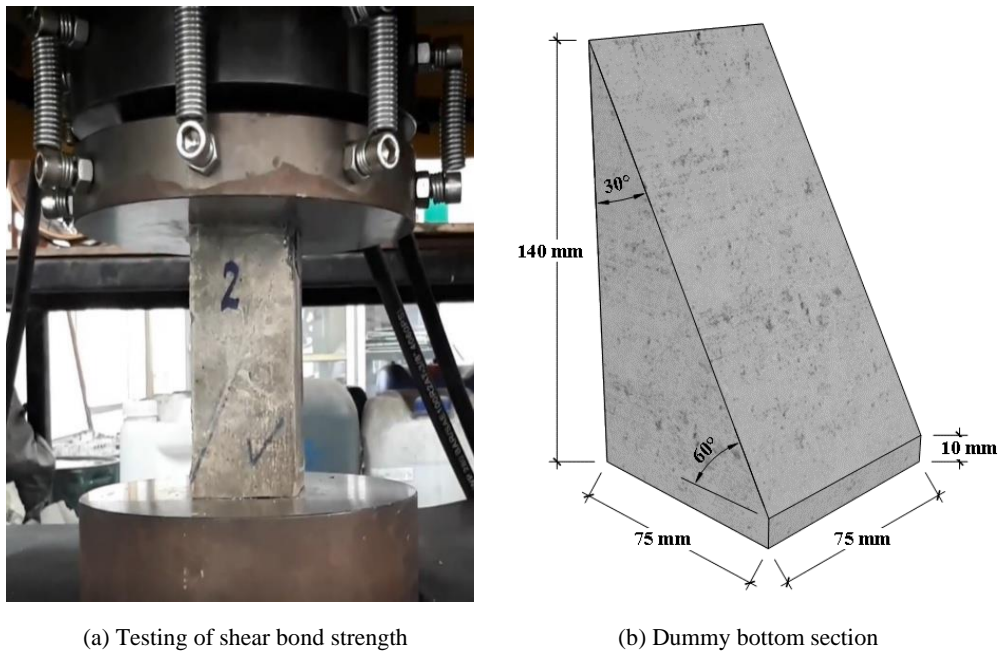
Shear bond strength test of high-calcium fly ash geopolymer concrete containing RACCA: (a) testing of shear bond strength; (b) dummy bottom section
